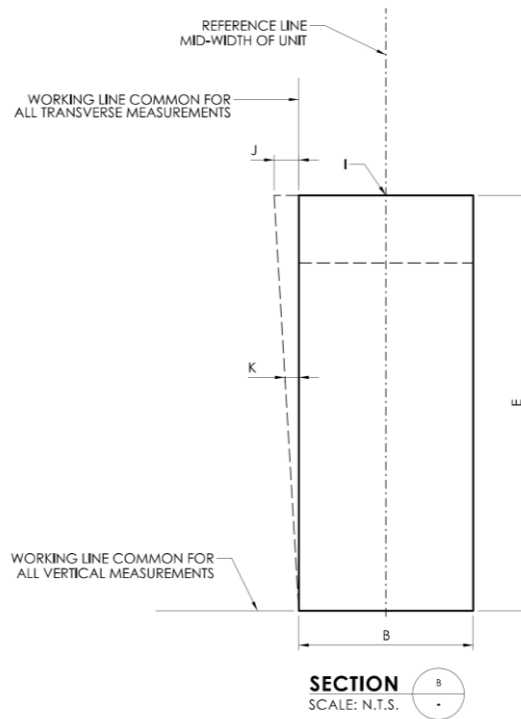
Three-Side Frame Fabrication Tolerances Section
